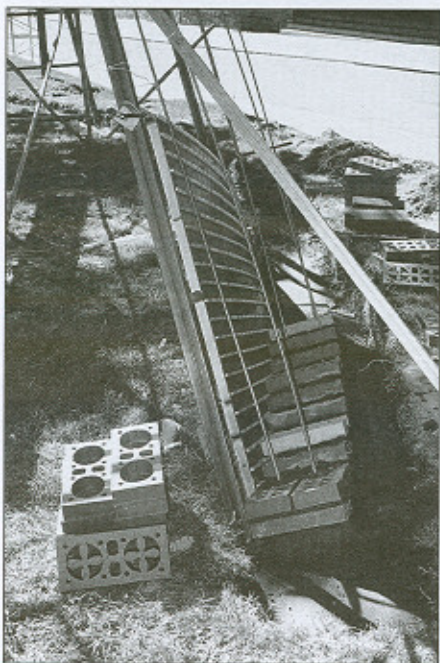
Triangular edge guide for raising of brickwork above foundations.
